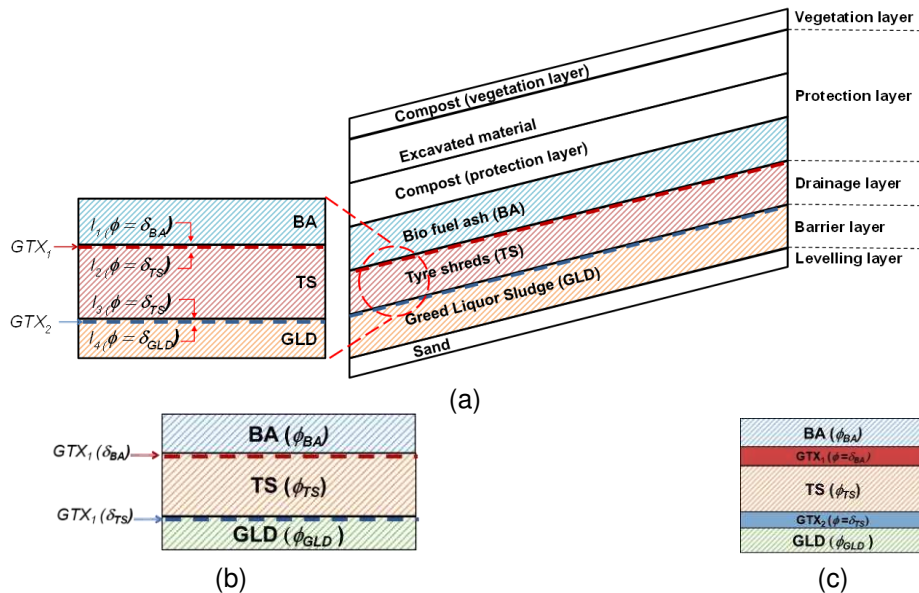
(a) Position and interfaces of geotextiles (b) Geotextiles modelled as reinforcement (c) Geotextiles modelled as layers
